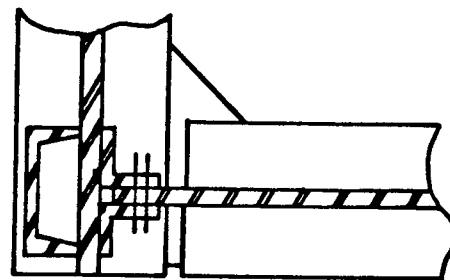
Cantilevers with Twisting and Lateral Deflection Prevented at Tips
